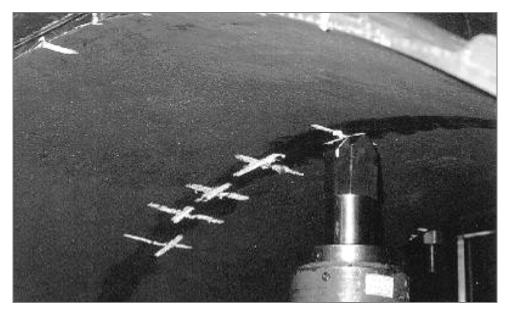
Position of the Platen Adjacent to the Weld Prior to Dynamic Loading
